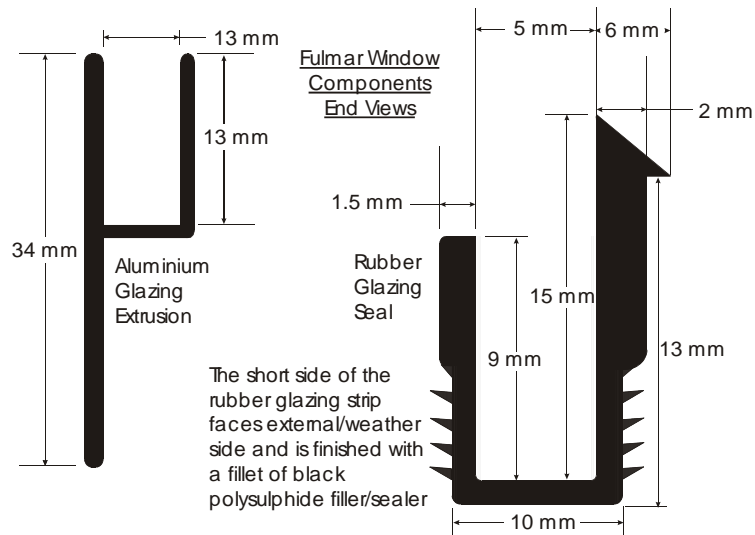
Glazing Frame & Rubber Extrusion Cross Section
